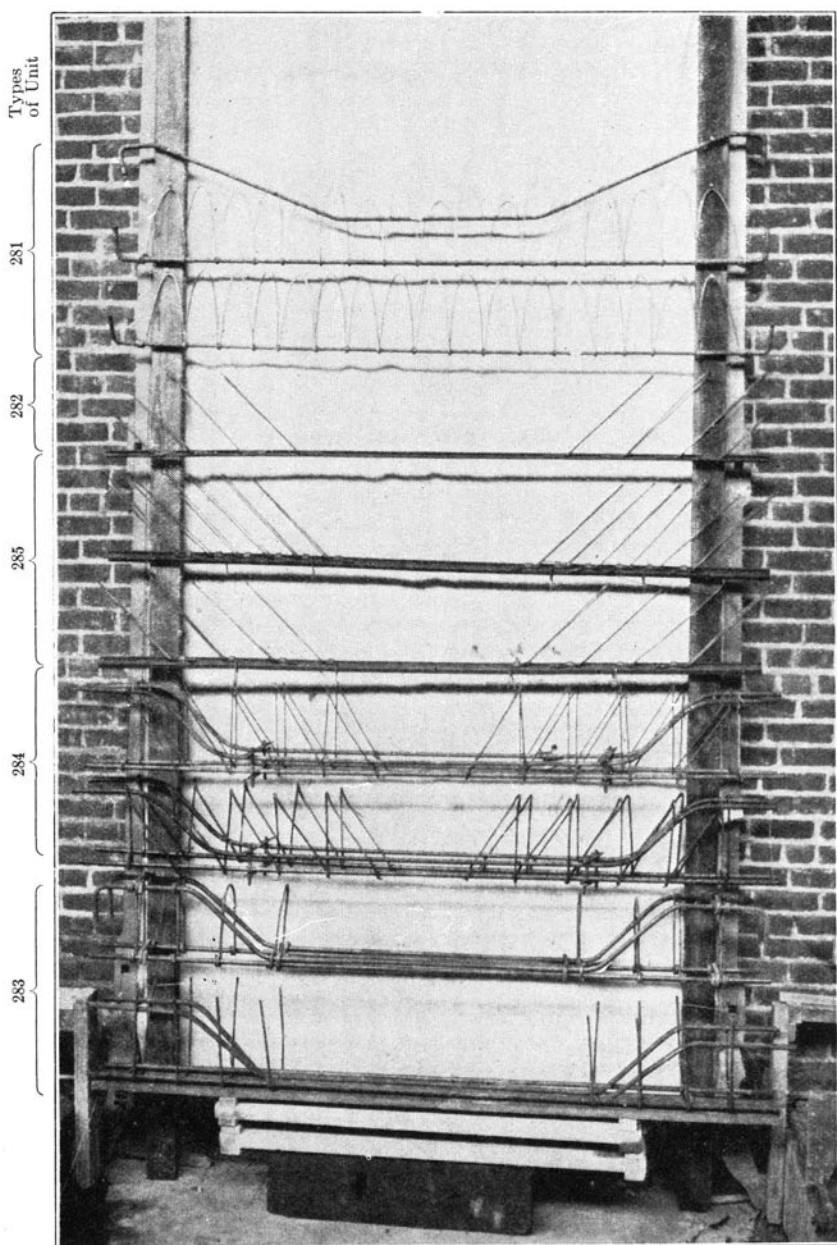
VIEWS OF UNIT FRAME REINFORCEMENT OF SEVERAL TYPES
